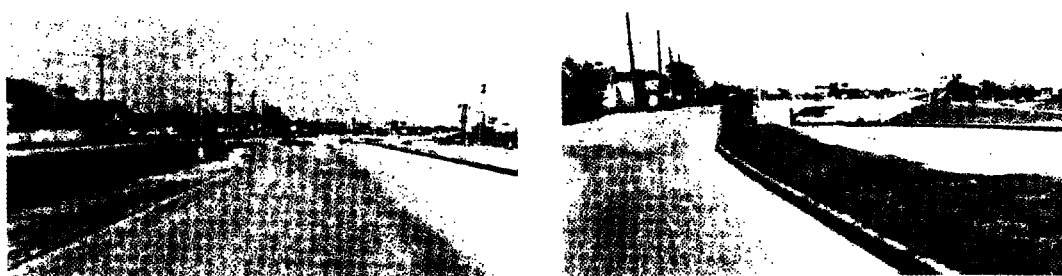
On-ramp outbound from Horne Street, East-West Freeway, Fort Worth: Left—view from auxiliary lane, and right—driver's view of freeway looking back from ramp.
